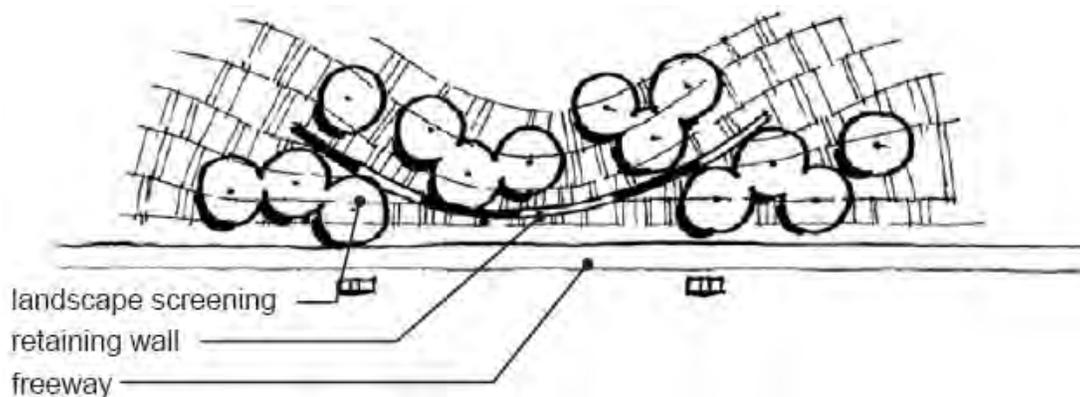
Terrain-contoured wall in cut section (Plan View)
